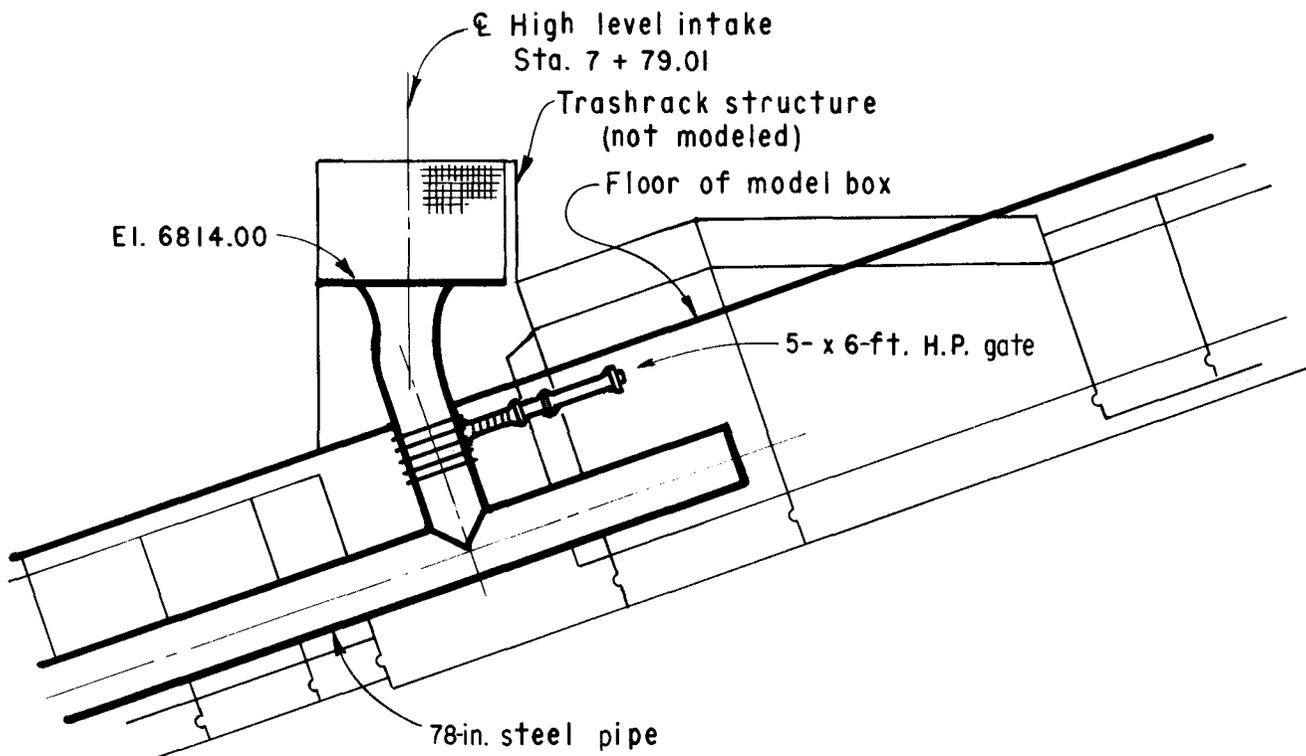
Ridgway multilevel outlet conduit — high-level intake.
